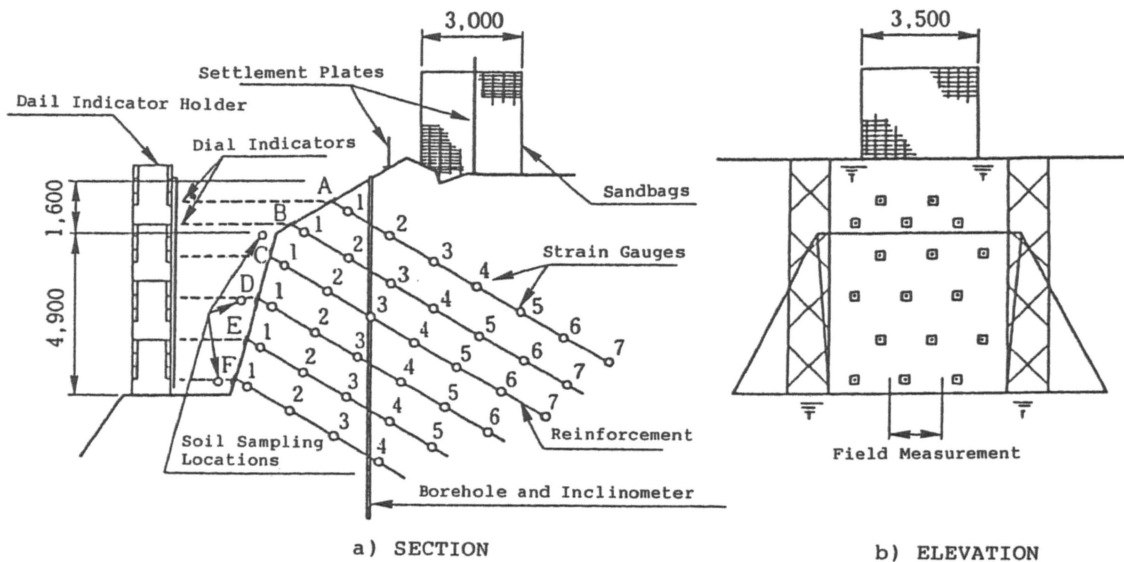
Section and Elevation of the Reinforced Slope for the Field Test
